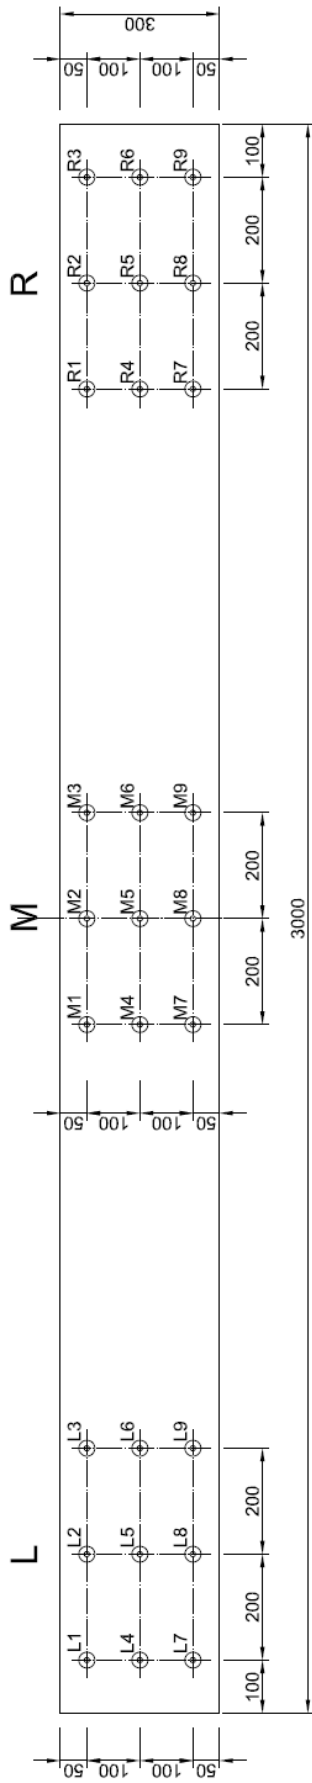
9 DEMEC points arrangement (R1 beam – reactive plain concrete beam)
